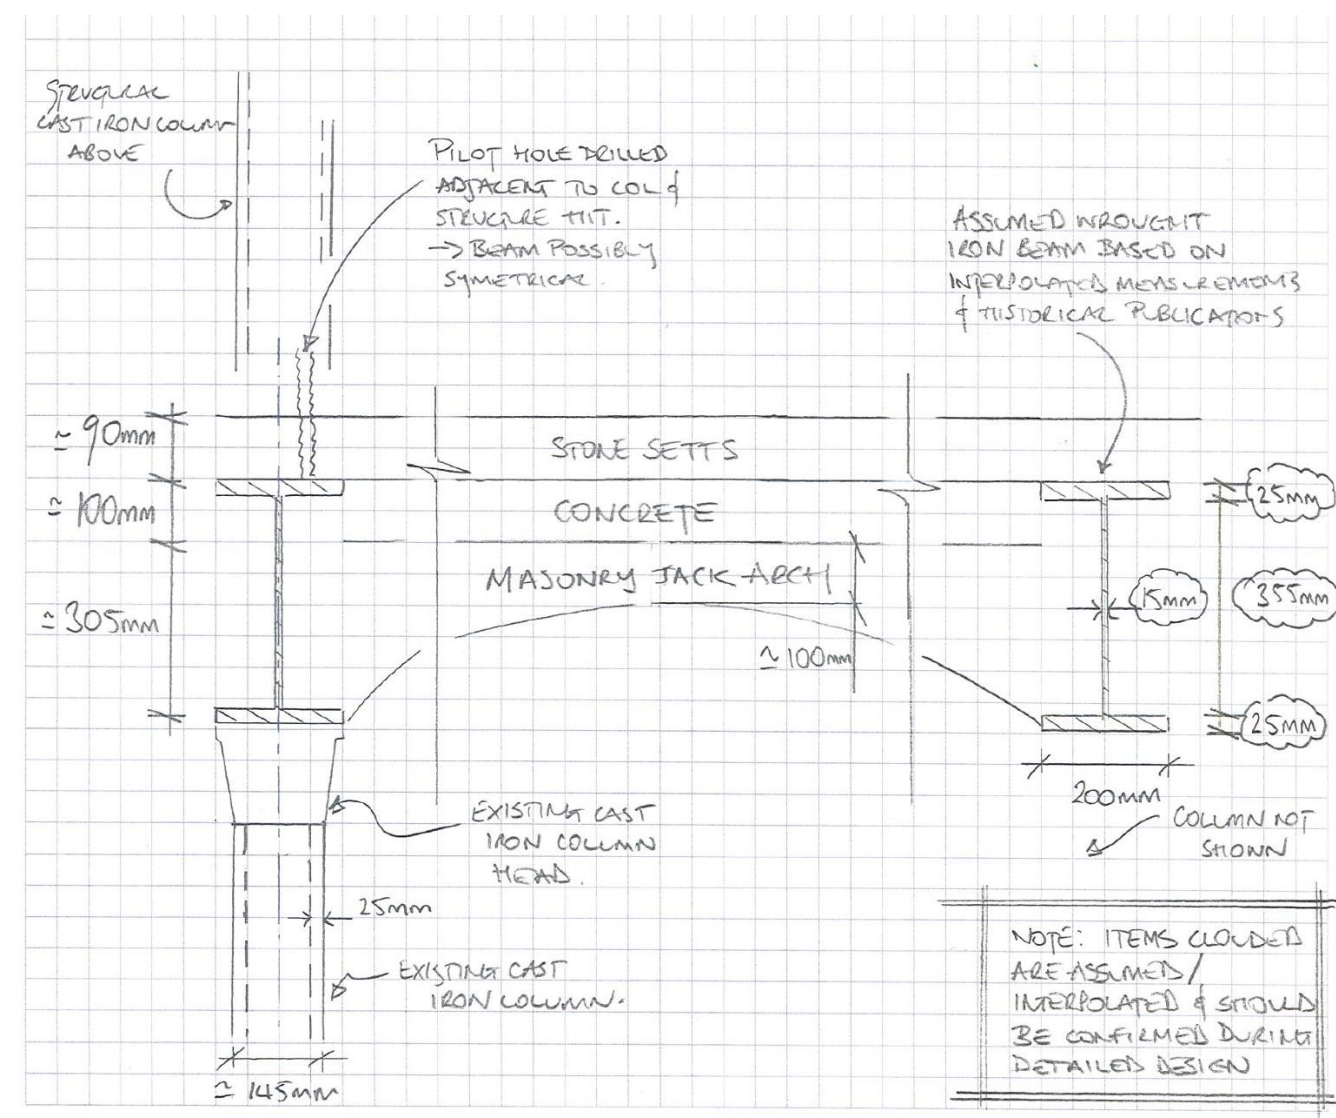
Masonry Jack Arch Floor Slabs Sketch Section
